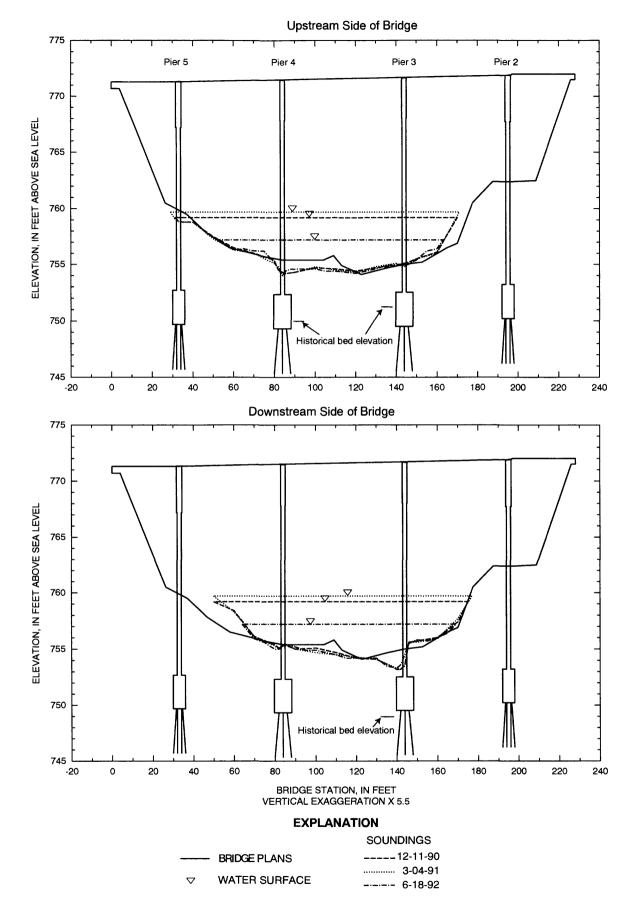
Cross sections showing bed elevations from bridge plans and soundings, State Road 110 over Tippecanoe River near Mentone, Indiana.
